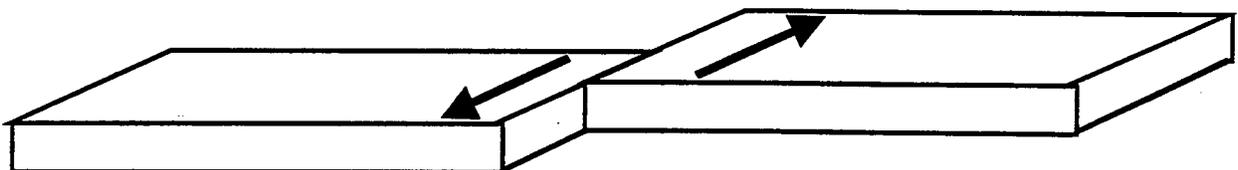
Movements in Underlying Pavement Layers That Contribute to Reflective Cracking (After Mukhtar and Dempsey, 12)
